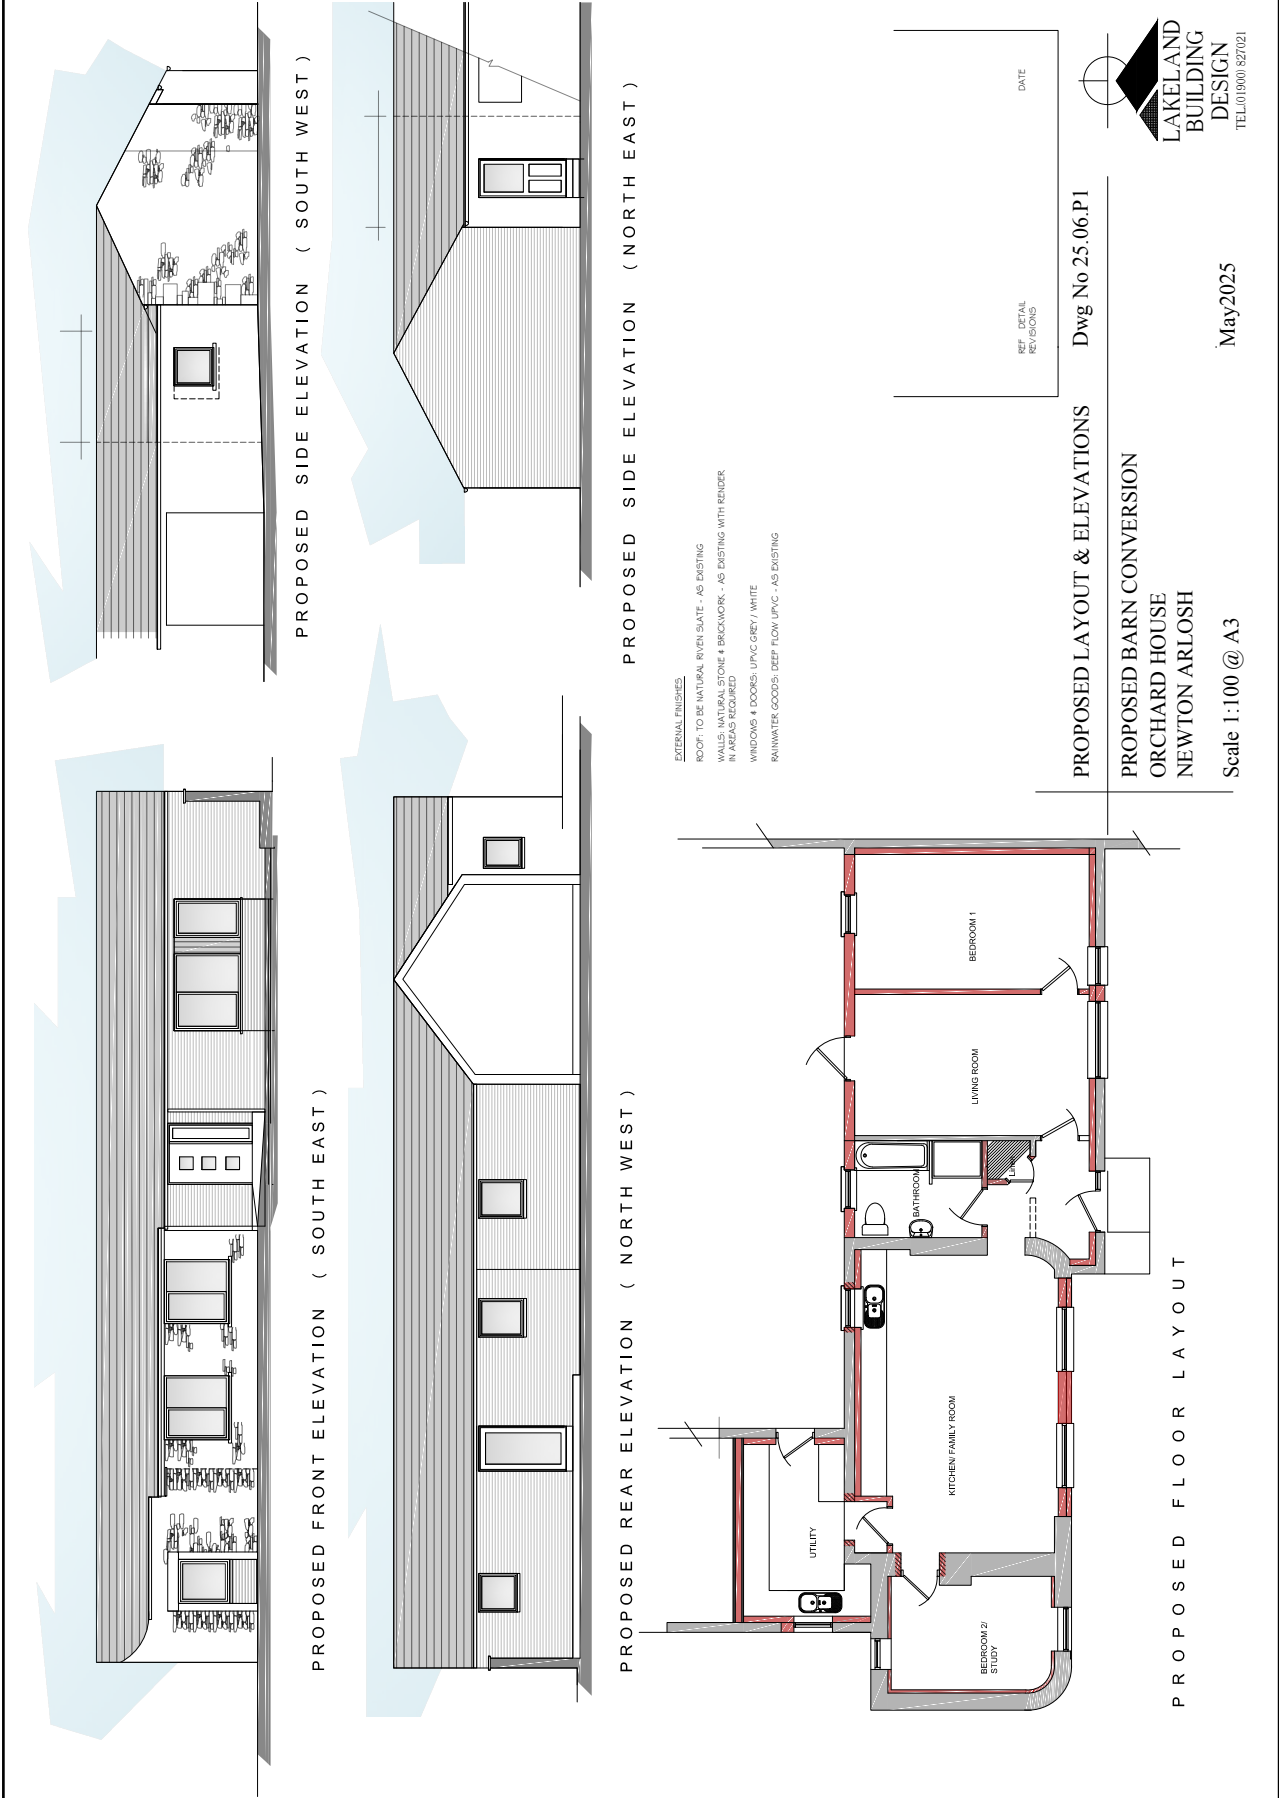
Plans As Proposed. Drawing By Lakeland Building Design.
